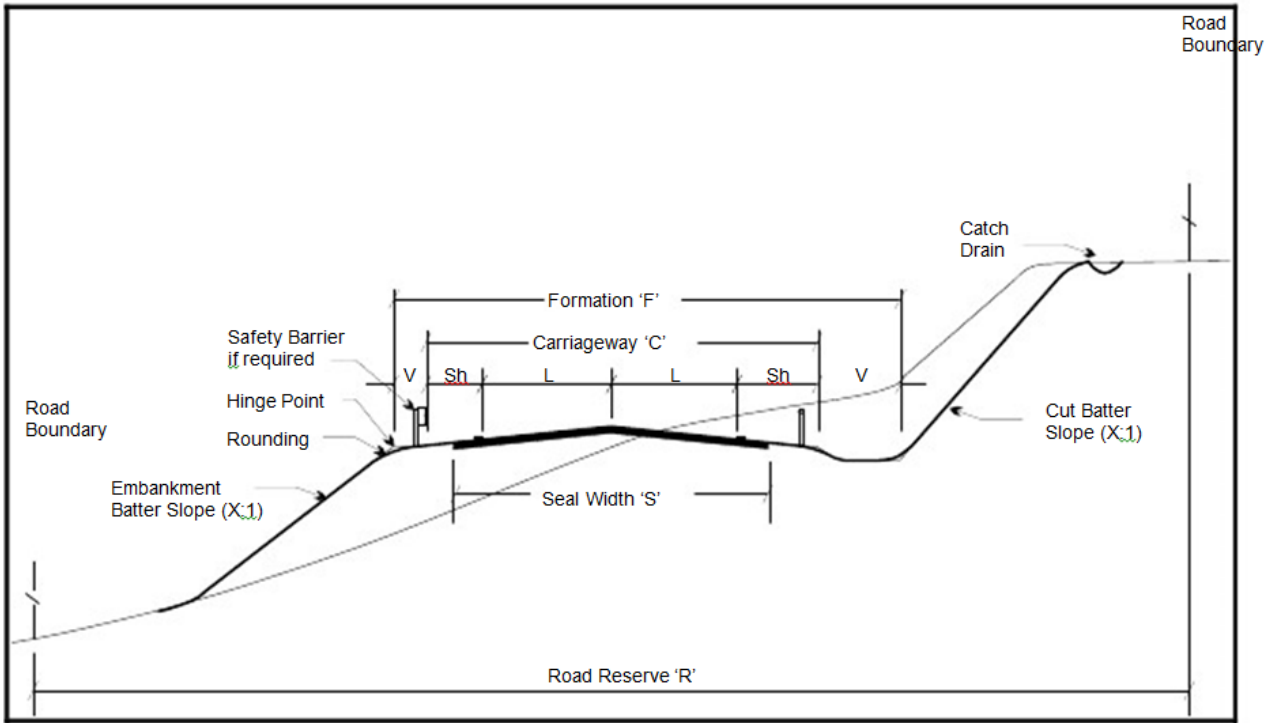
Typical Cross Section – Unkerbed Roads
